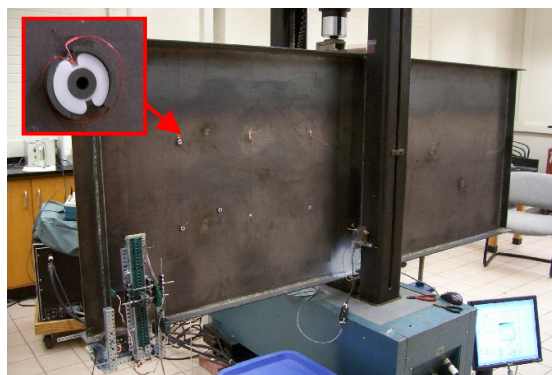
Plate girder specimen; flange-crawling i at lower left
